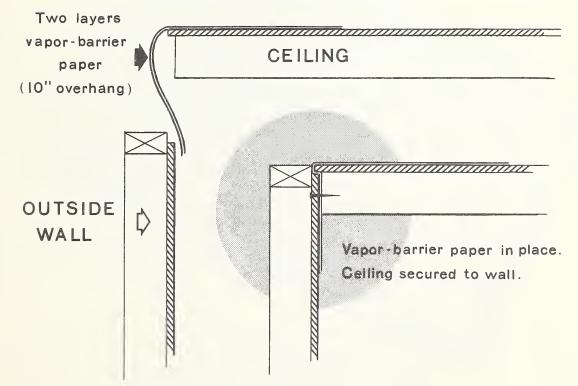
Position of vapor barrier when lowering ceiling into place.
